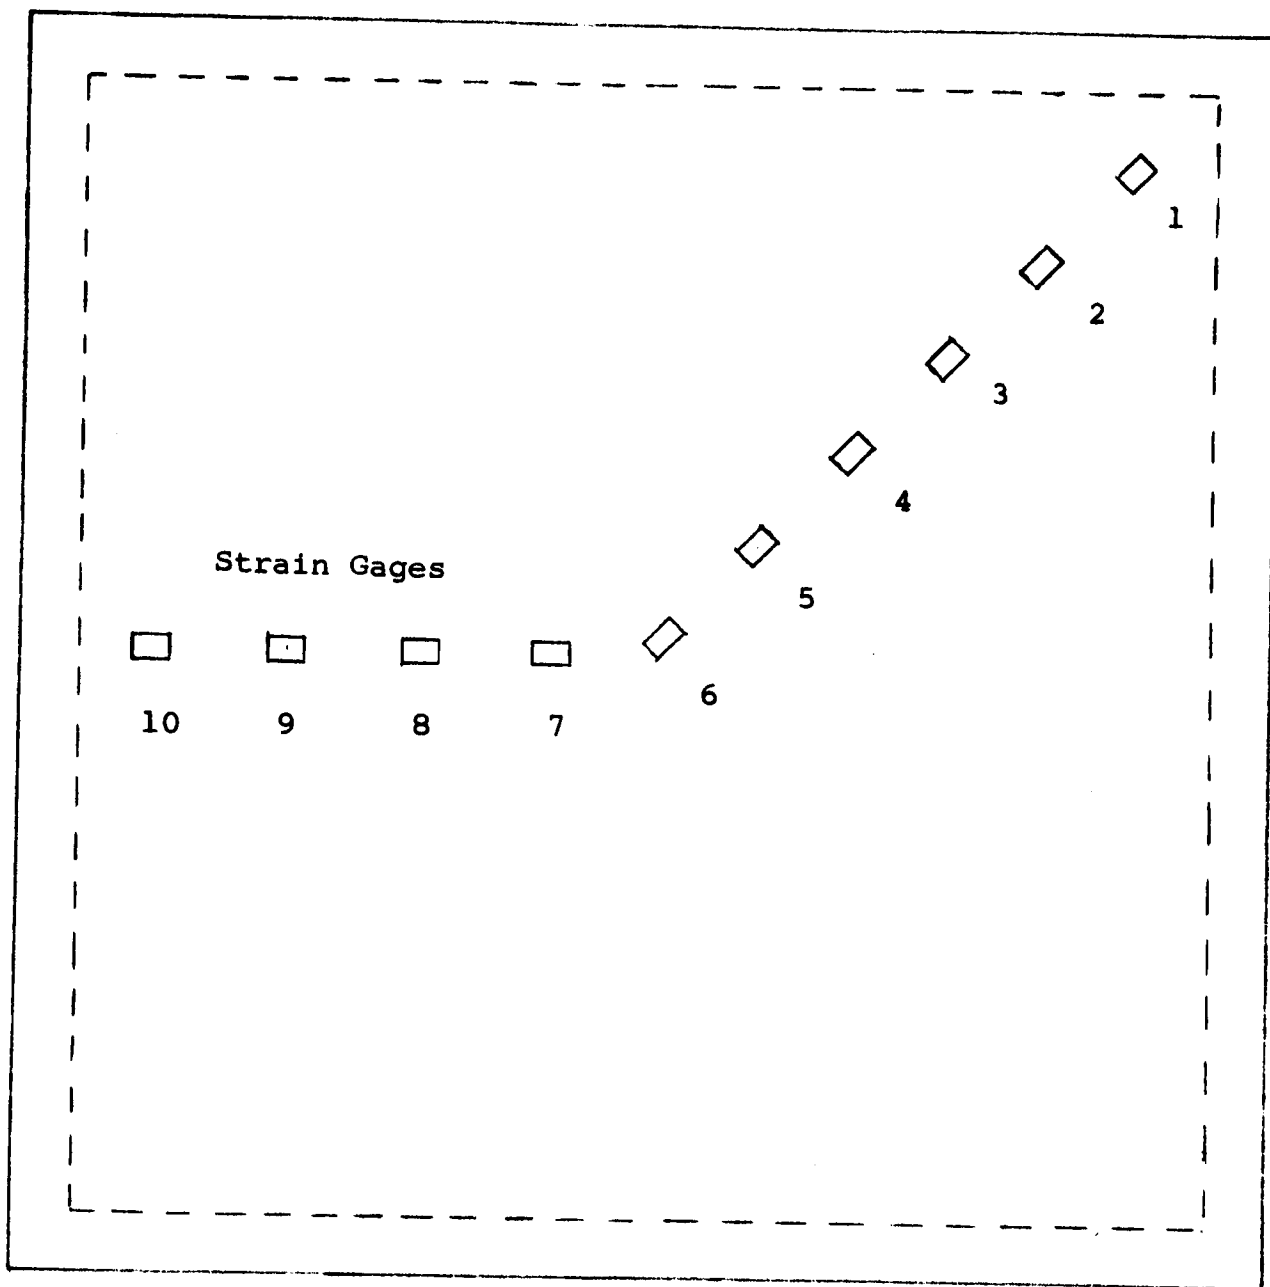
DRAWING OF SPECIMEN SHOWING PLACEMENT
